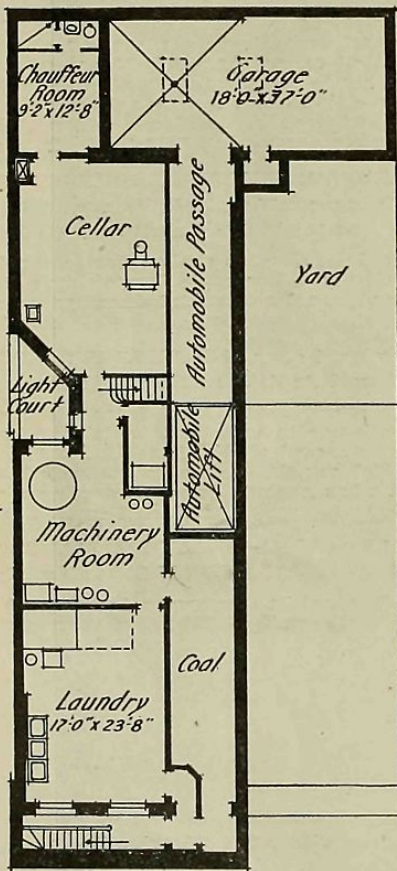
BASEMENT PLAN.—ERNEST FLAGG'S HOUSE.
